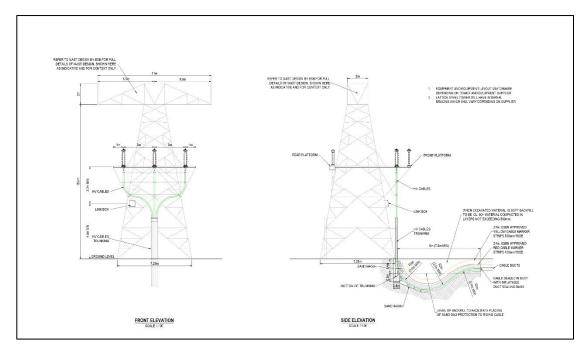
Typical Mast Detail (CSEA Sheet:1530)
